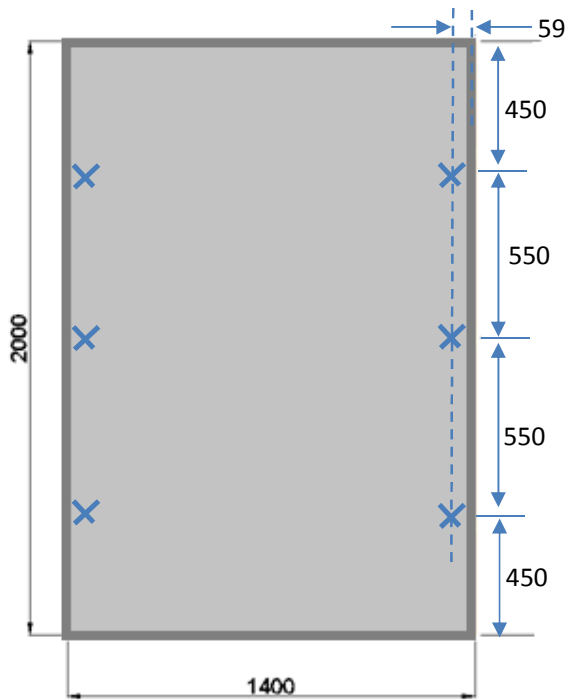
Schematic location of anchors for tension tests (all dimensions specified in mm), plan view
